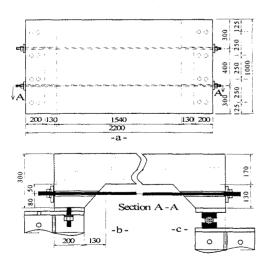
Details of the panels, a- Typical Plan view, b- Section in the fixed panel, c- Section in the simple supported panel
